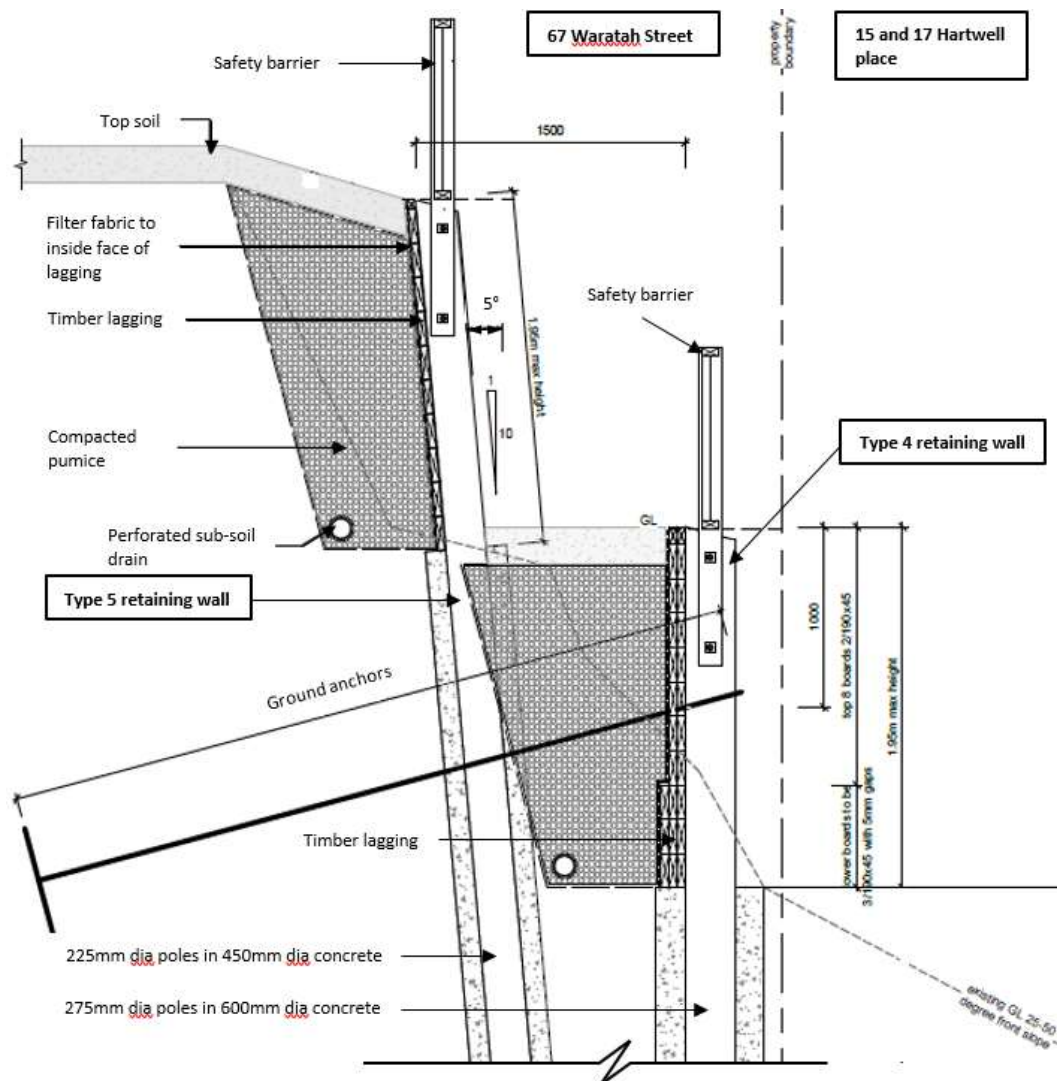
Typical cross-section through retaining wall Types 4 and 5 (not to scale)
